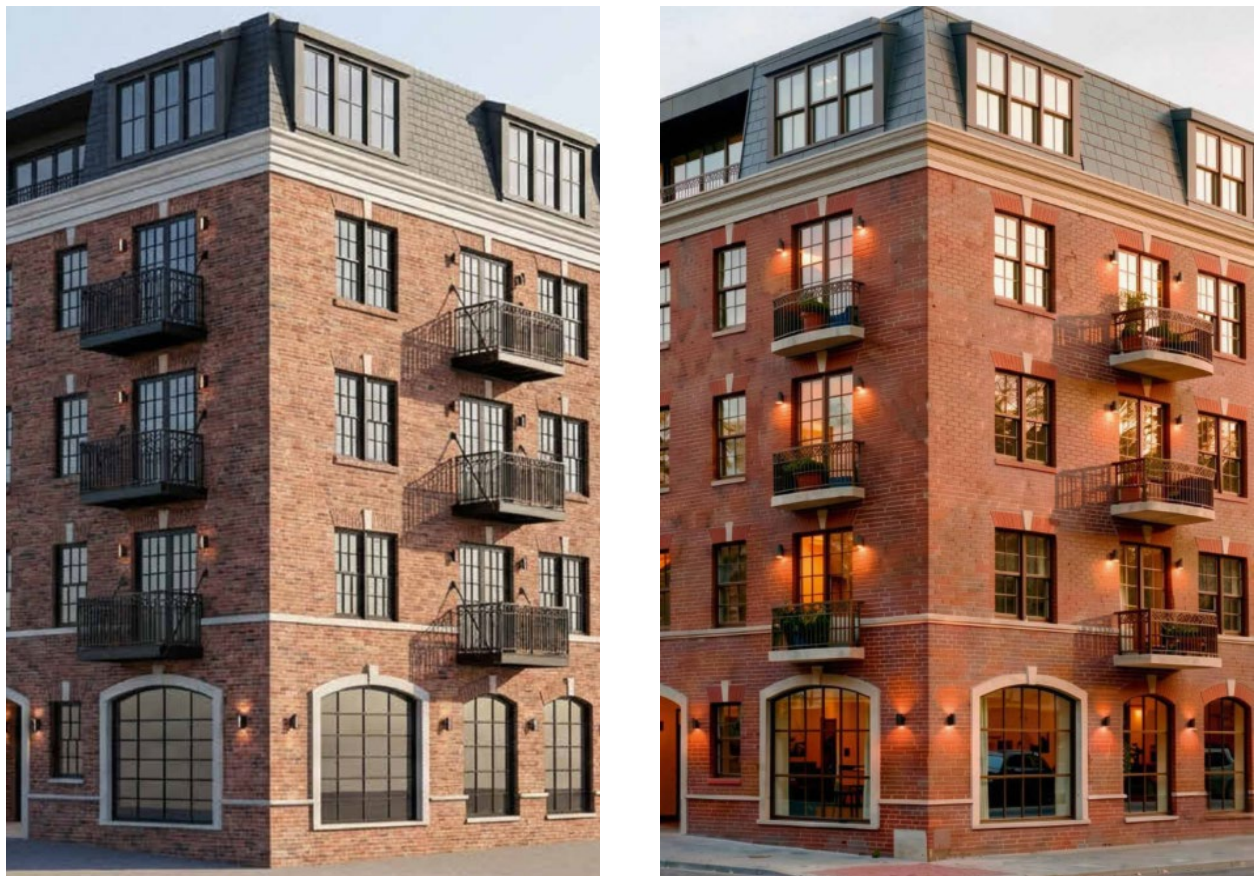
Previous (left) and revised (right) view showing proposed balconies
